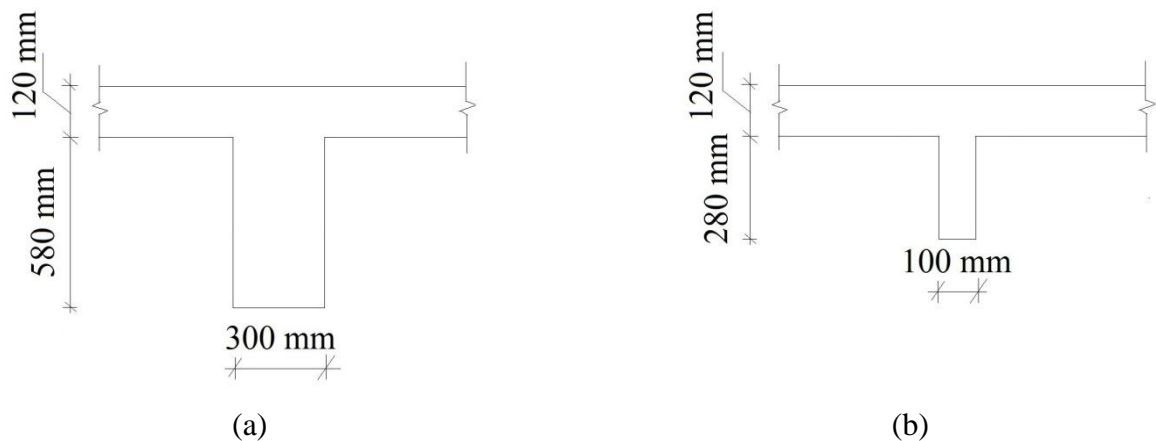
Dimensions of Slab and Joists (a) One-Way Joist, (b) Two-Way Joist.
